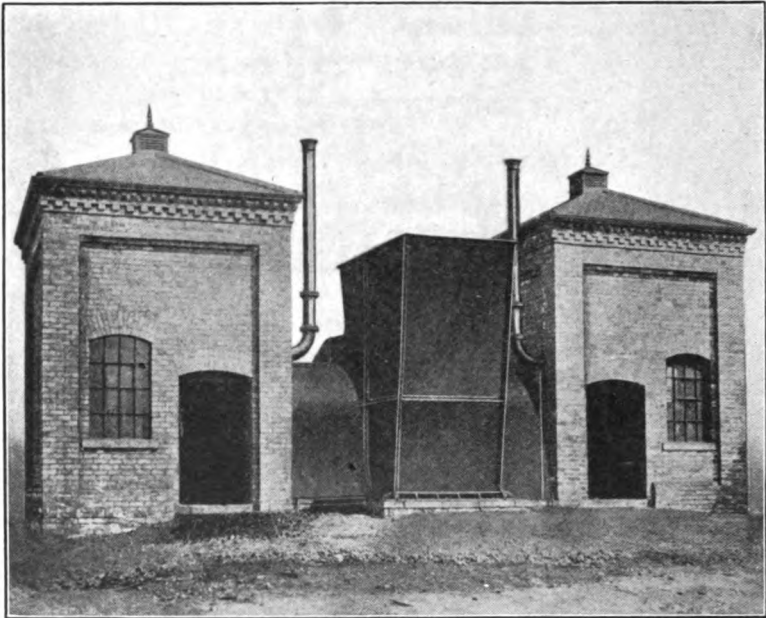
The Chandler Fan: External View of Fan-casing and Engine-houses.
